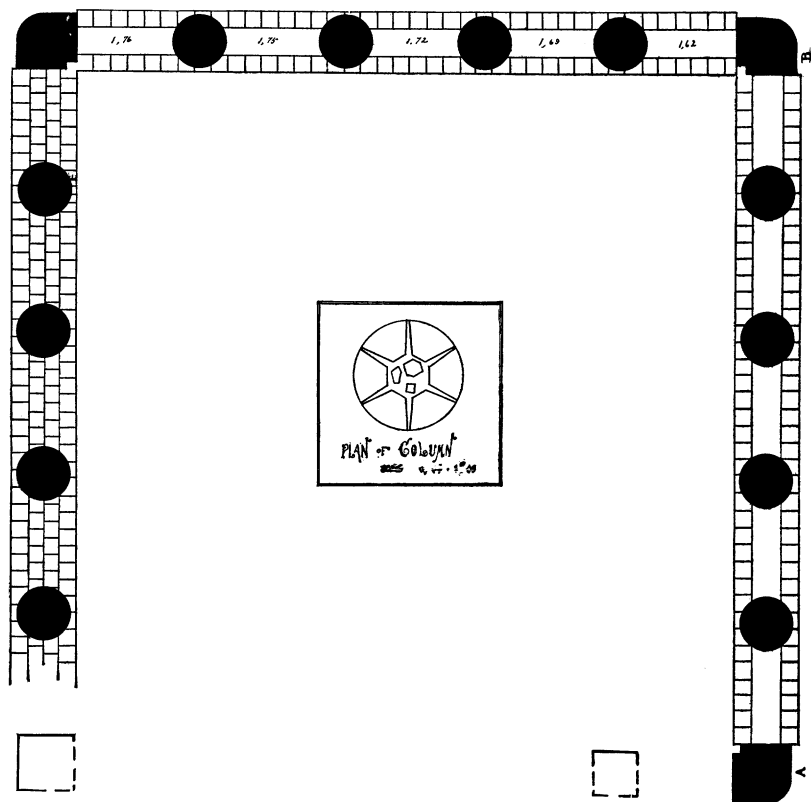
COURT OF COLUMNS. EXCAVATIONS OF 1889. SCALE, .008 M. = 1 M.
